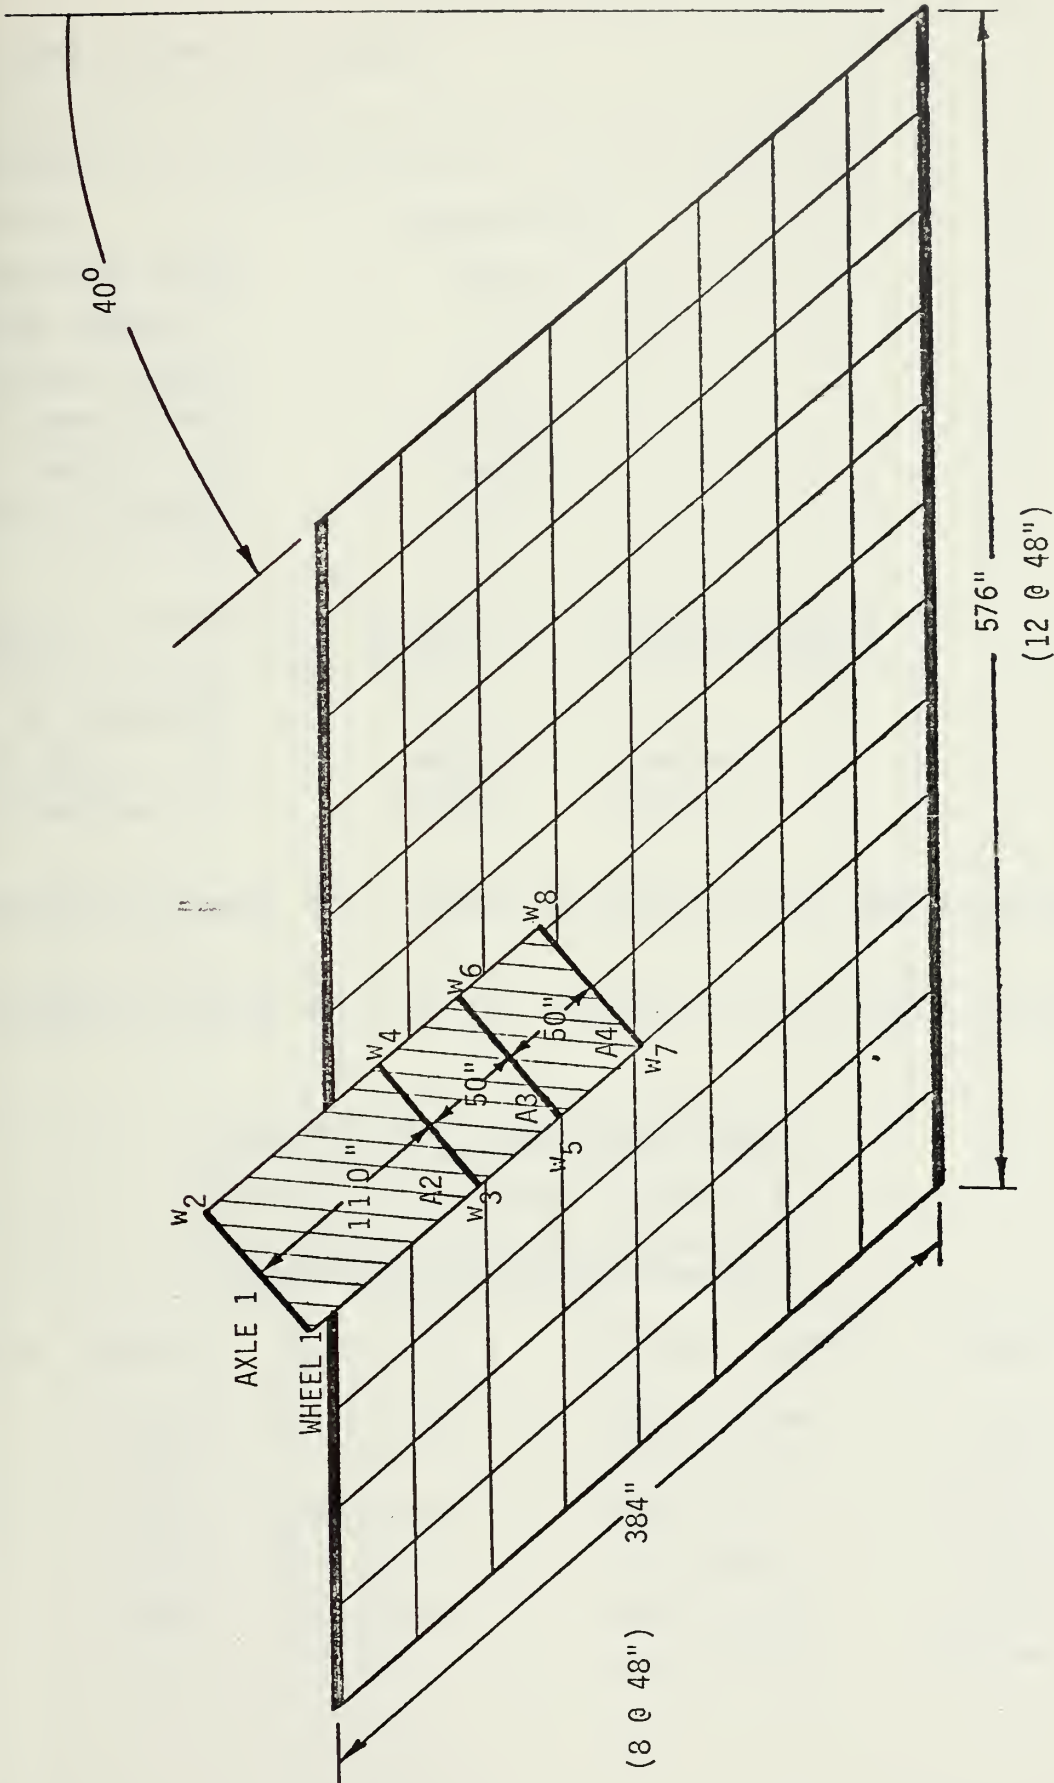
SKEWED LOADER EXAMPLE 1 (SU-4)
